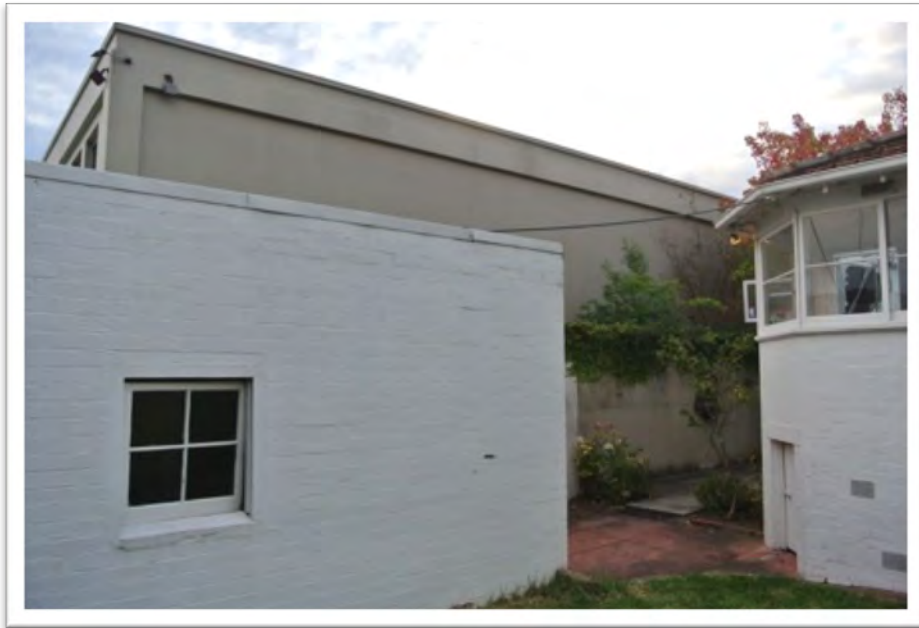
View west from rear of Land to rear of neighbouring dwelling at 4 Dunraven Avenue
